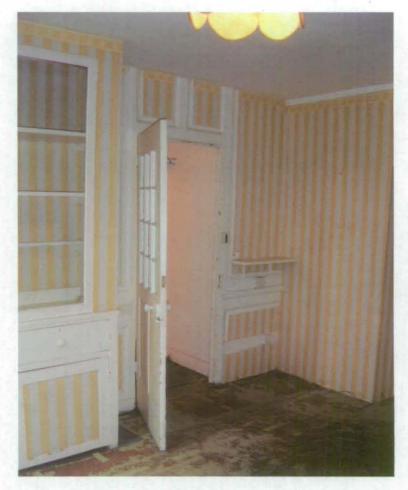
High-quality panelling [15] inserted to form a new west wall in the former kitchen, dividing B16 from a passage beyond, B17; looking north-west. The panelling is too large for its present position and was perhaps taken from elsewhere in the house. The dado rail has been shaved to allow the glass-panelled door to swing flat against this wall, suggesting that the dresser was added to the wall later (A J Browne, Architects)
